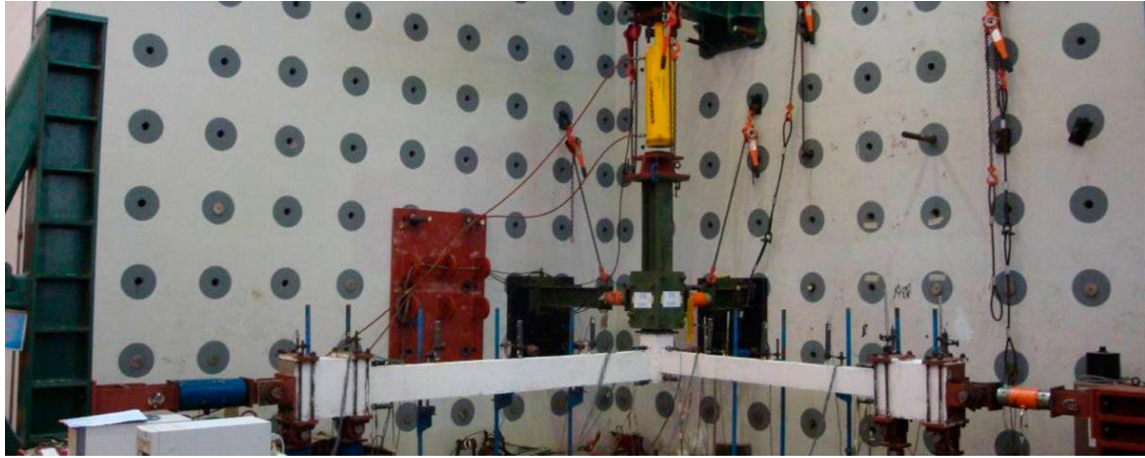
test setup and the specimen (Qian et al. 2013)
